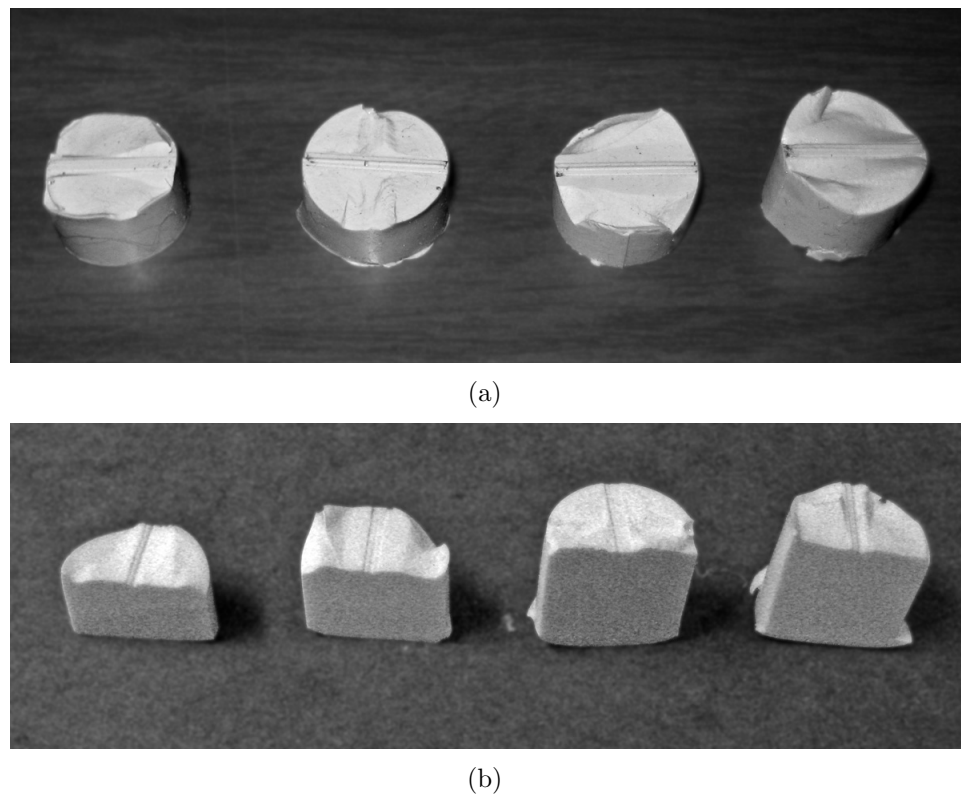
(a) Plastic castings replicating the fracture surfaces of ITCR specimens; (b) castings were ground down incrementally for measurement of local crack deflection.
